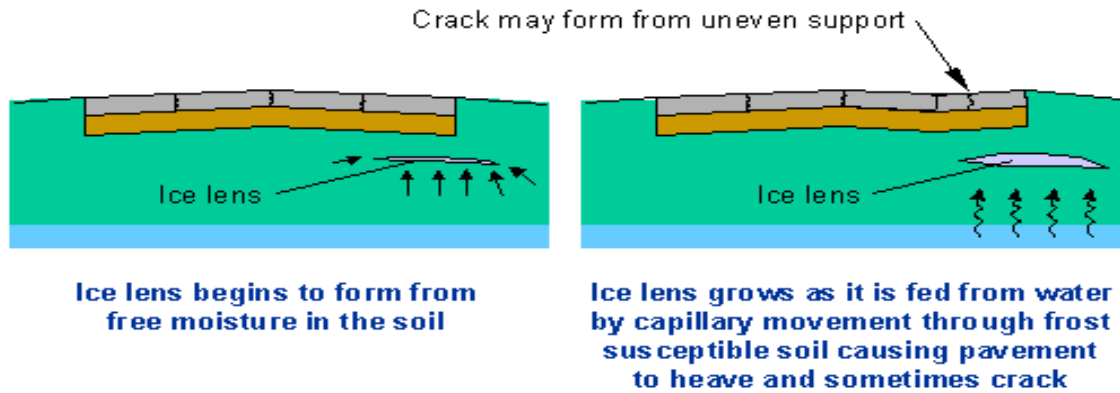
Formations of Ice Lens and Frost Heave (American Concrete Pavement Association 2013).
